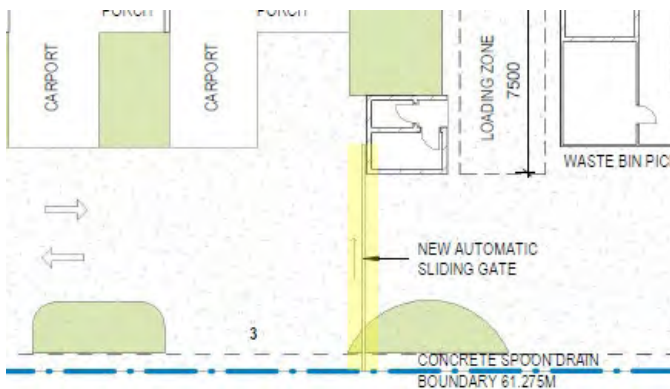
Proposed Automatic sliding gate (highlighted yellow) – Proposed Site Plan, prepared by Funarchi, 25/03/2026
